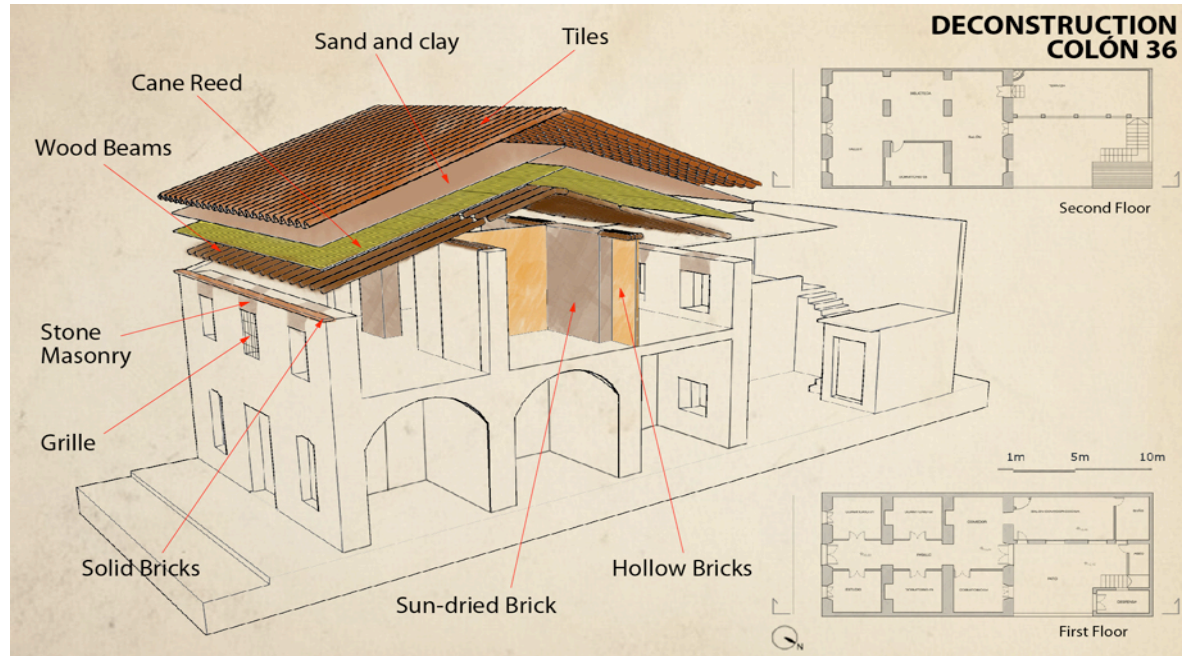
Deconstruction process. www.architectureindevelopment.org/project.php?id=354
